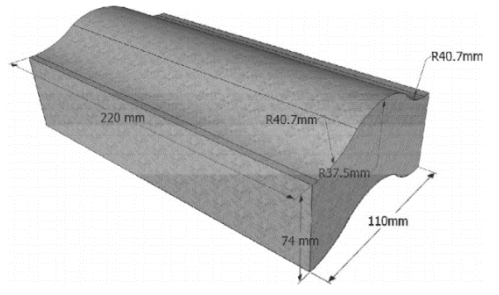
Shape and Dimension of the specimen (Hossain et al., 2016)
